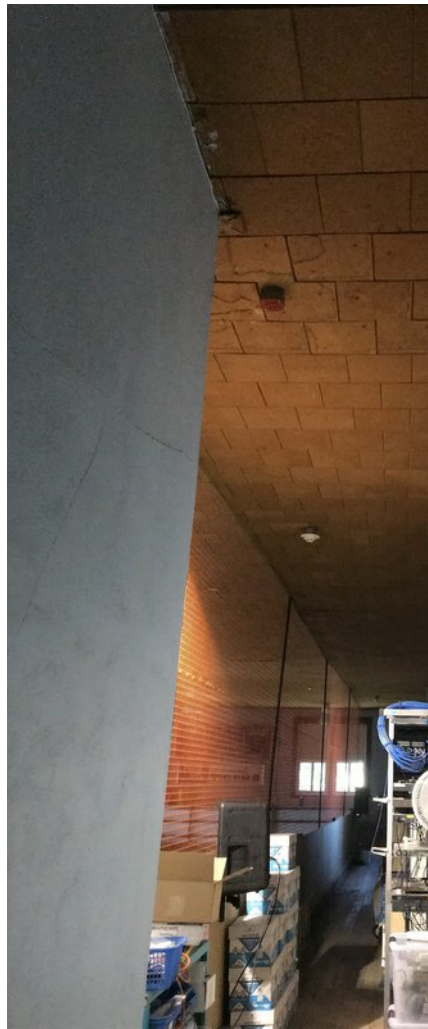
Evidence of Water Damage to Ceiling Finishes
